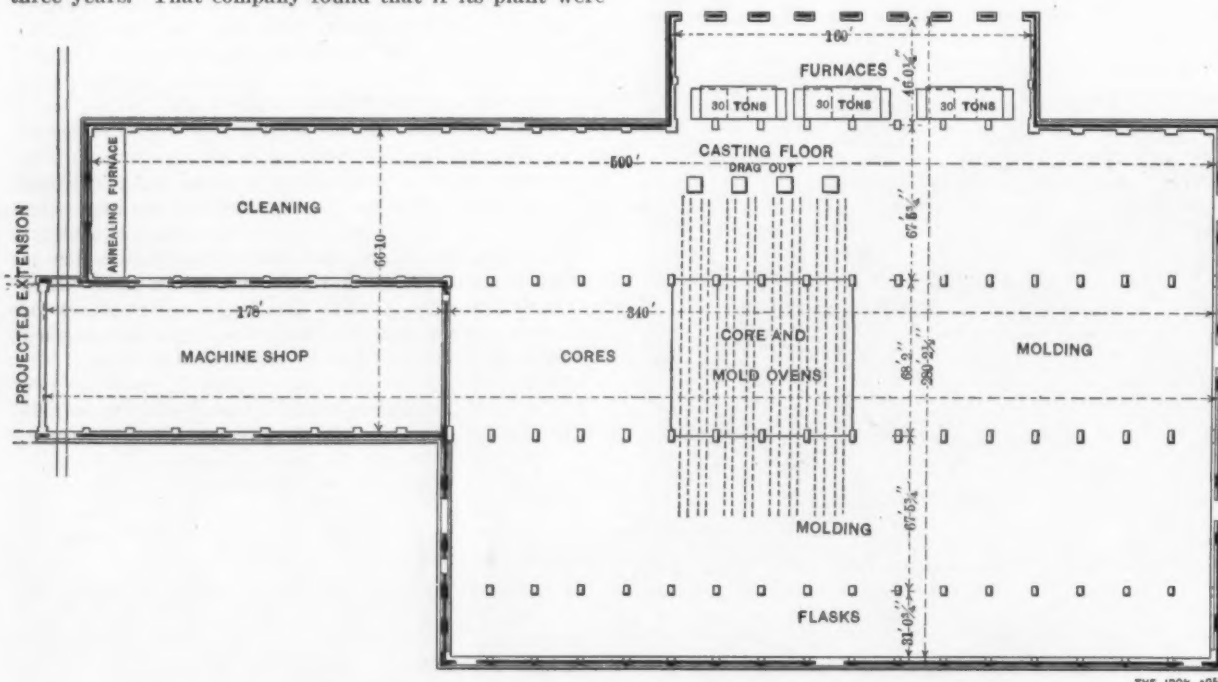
Plan View of the Baldt Steel Company's Foundry, New Castle, Del.
